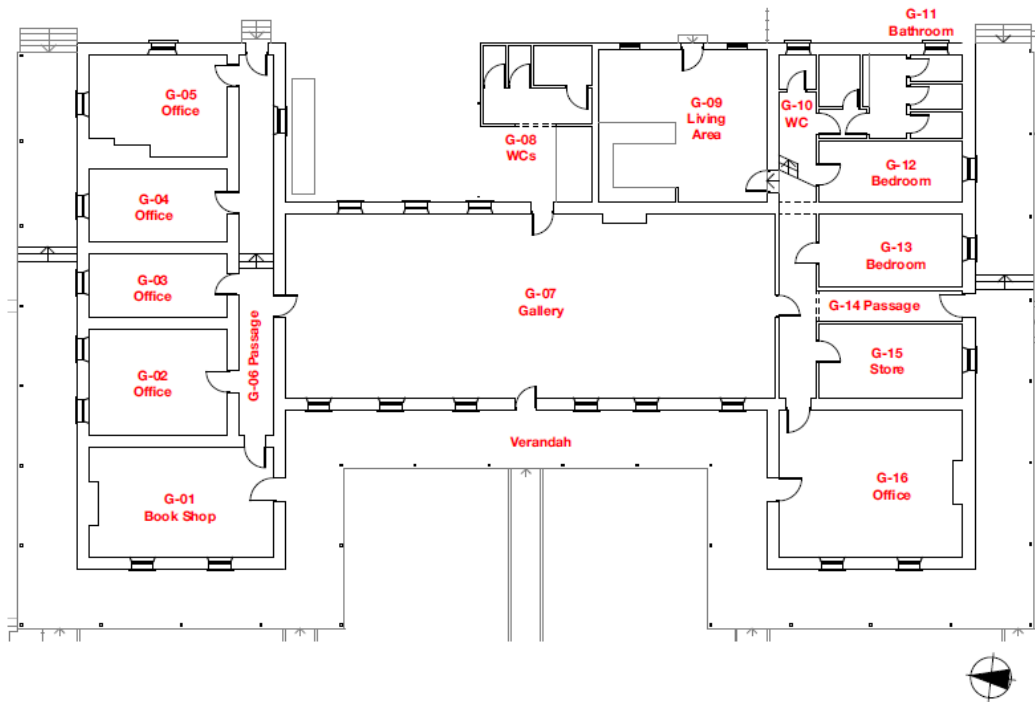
2020 Floor Plan, DAR Studio, 2020
